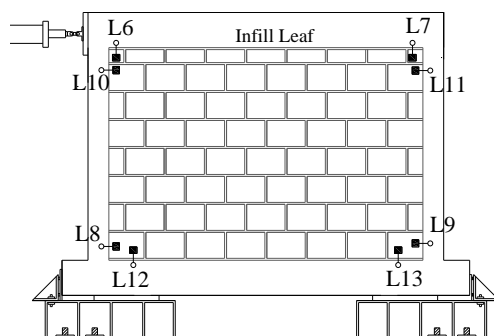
Position of LVDTs in RC frame and masonry infill leaf
